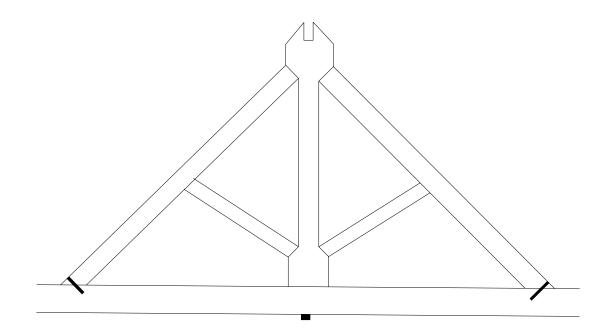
Sketch of Roof Truss, Building B (Not to Scale).
